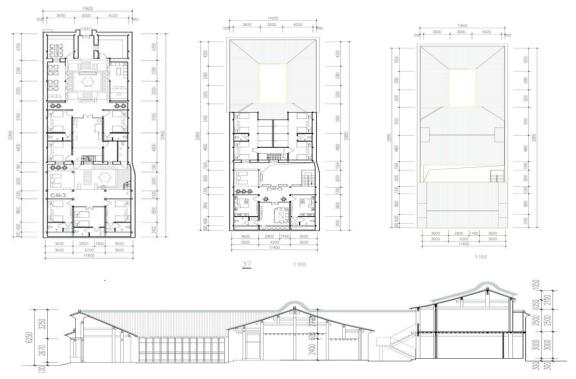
scheme drawing of No. 37 Institute after reconstruction
